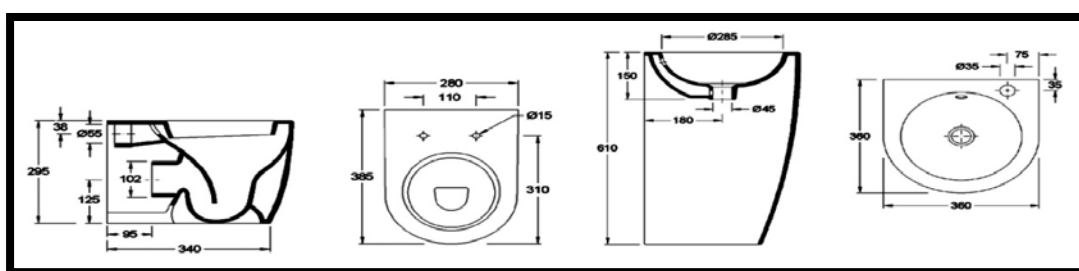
Layout shows the accepted height and width of toilet kits (Example ONLY)
